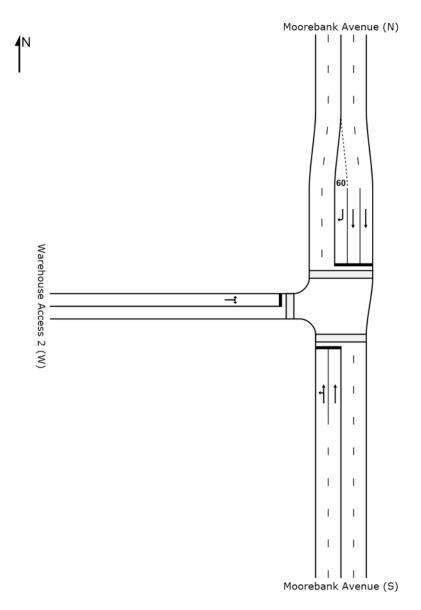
Proposed Moorebank Avenue and Warehouse Access 2 intersection
